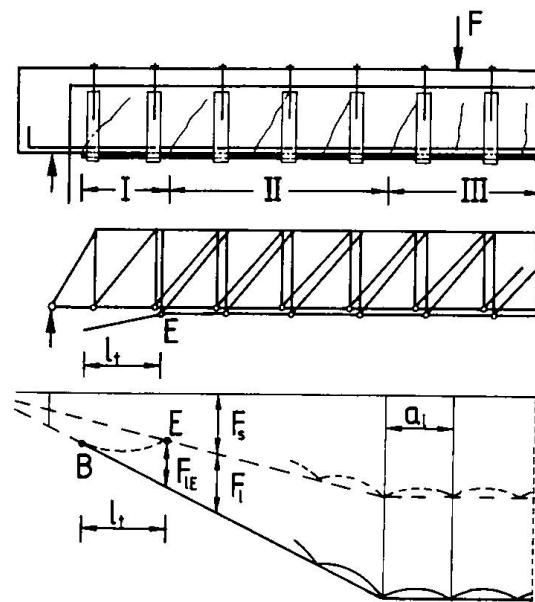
Truss model of a plate-strengthened beam, tensile forces according to TA and bond zones
